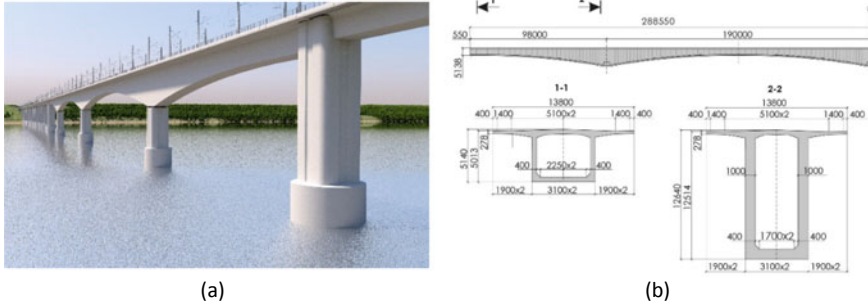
Volga River HS bridge: (a) photomontage and (b) elevation view and cross sections
